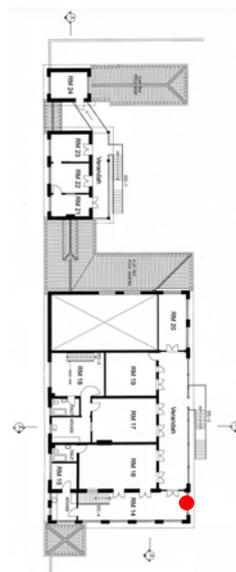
Segmental-headed timber window glazings on the first floor at RM 14.
